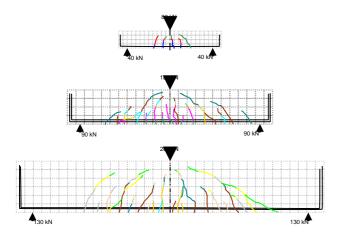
Crack Profile for H-0.0 Series beams at 1.7 MPa Stress level
